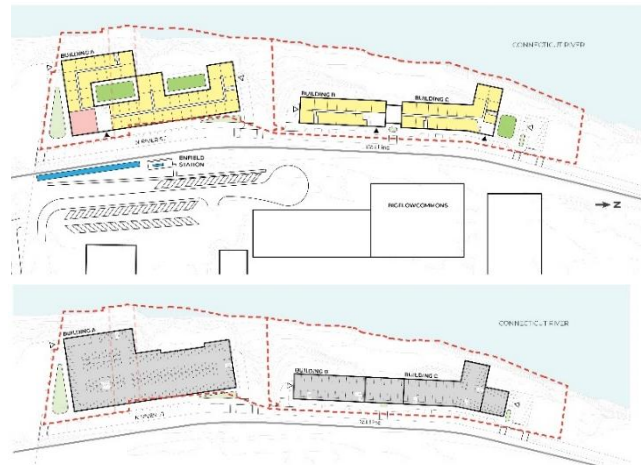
Enfield Station TOD Test-Fit Ground Floor and Garage Level Floor Plans
